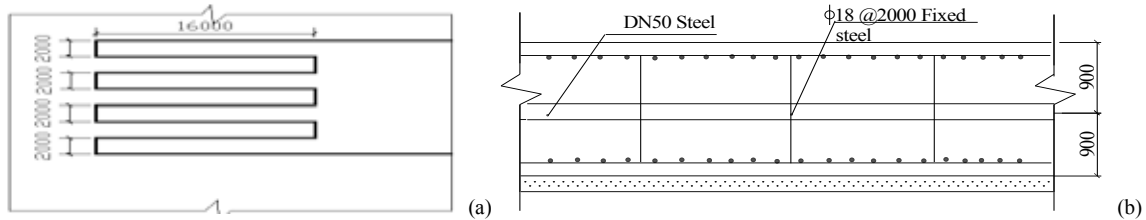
(a) Plan layout of cooling water pipe; (b) Vertical layout schematic of cooling water pipe
